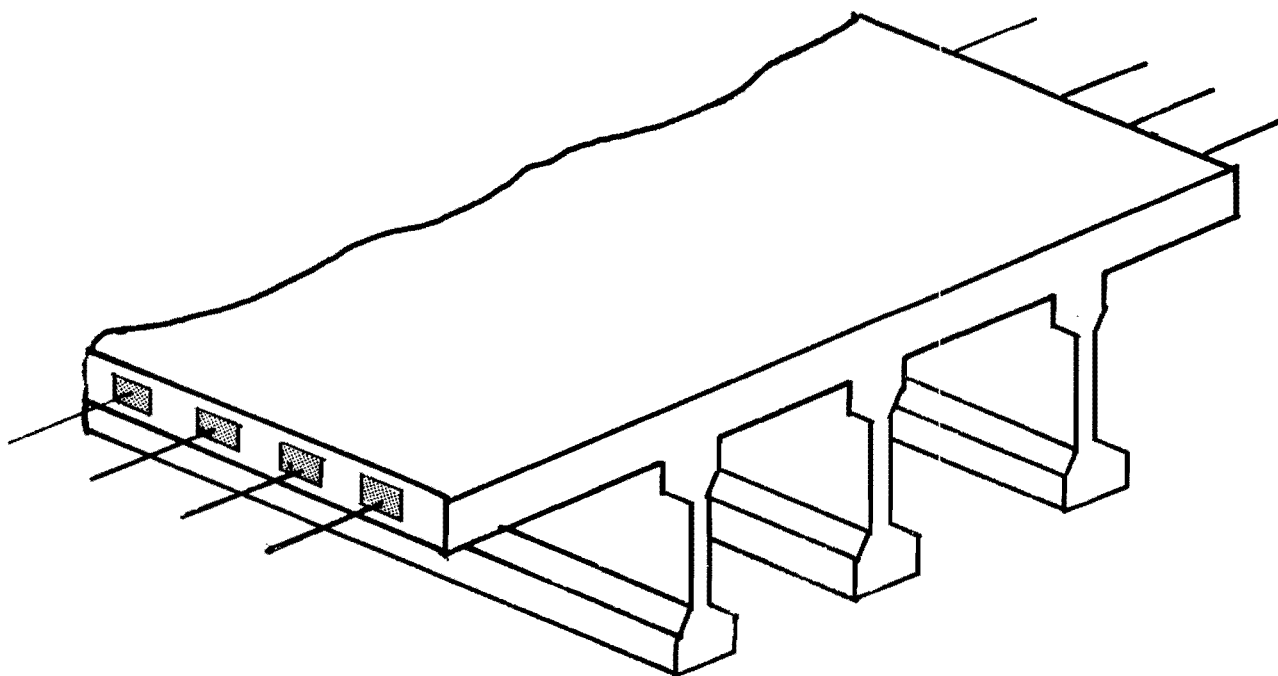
Multiple anchorage zones in a transversely prestressed bridge deck
